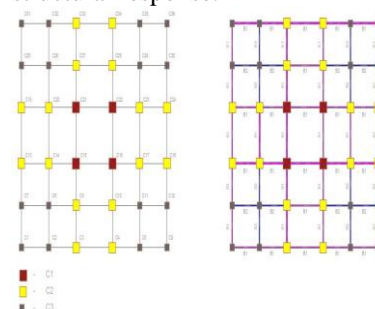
3D View of the Model Plan Layout of Column and Beam
